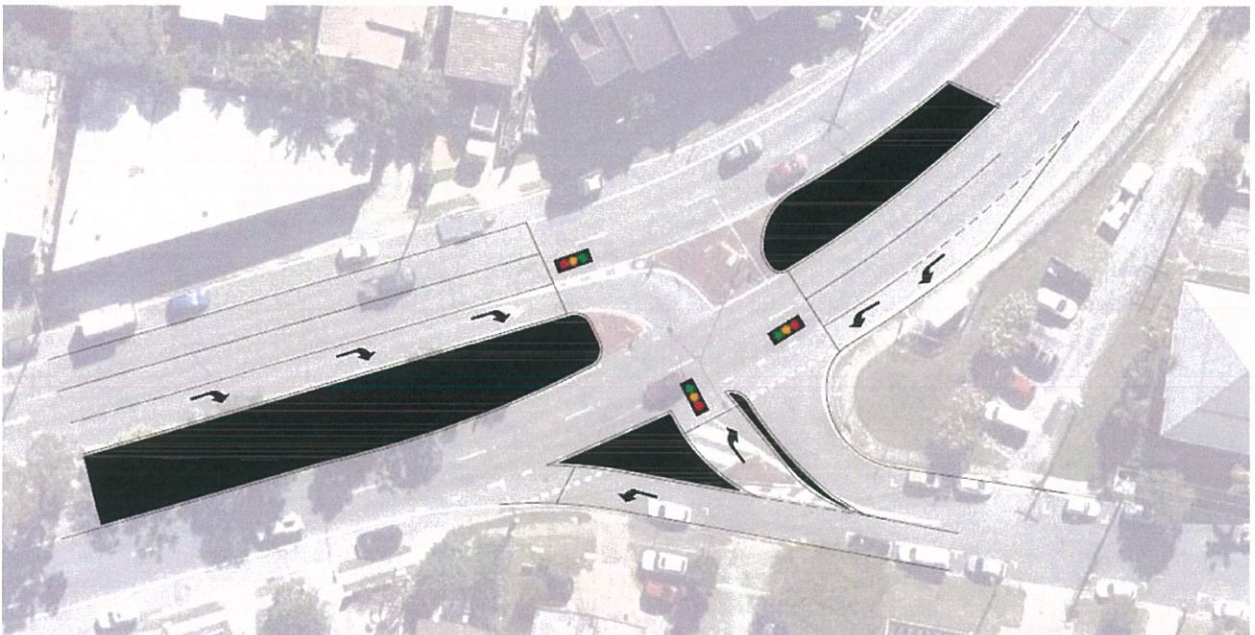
West Burleigh Road / Stanley Street Intersection Concept
